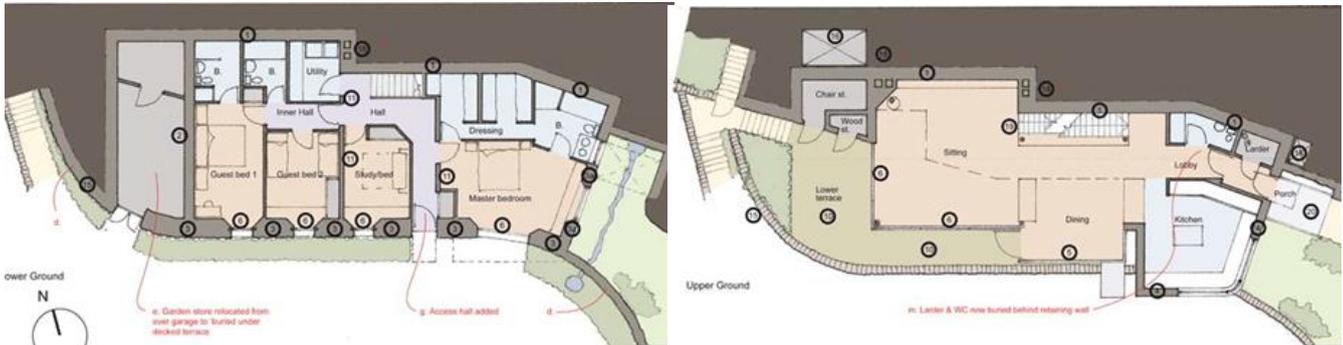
(a) Lower ground floor; (b) Upper ground floor
